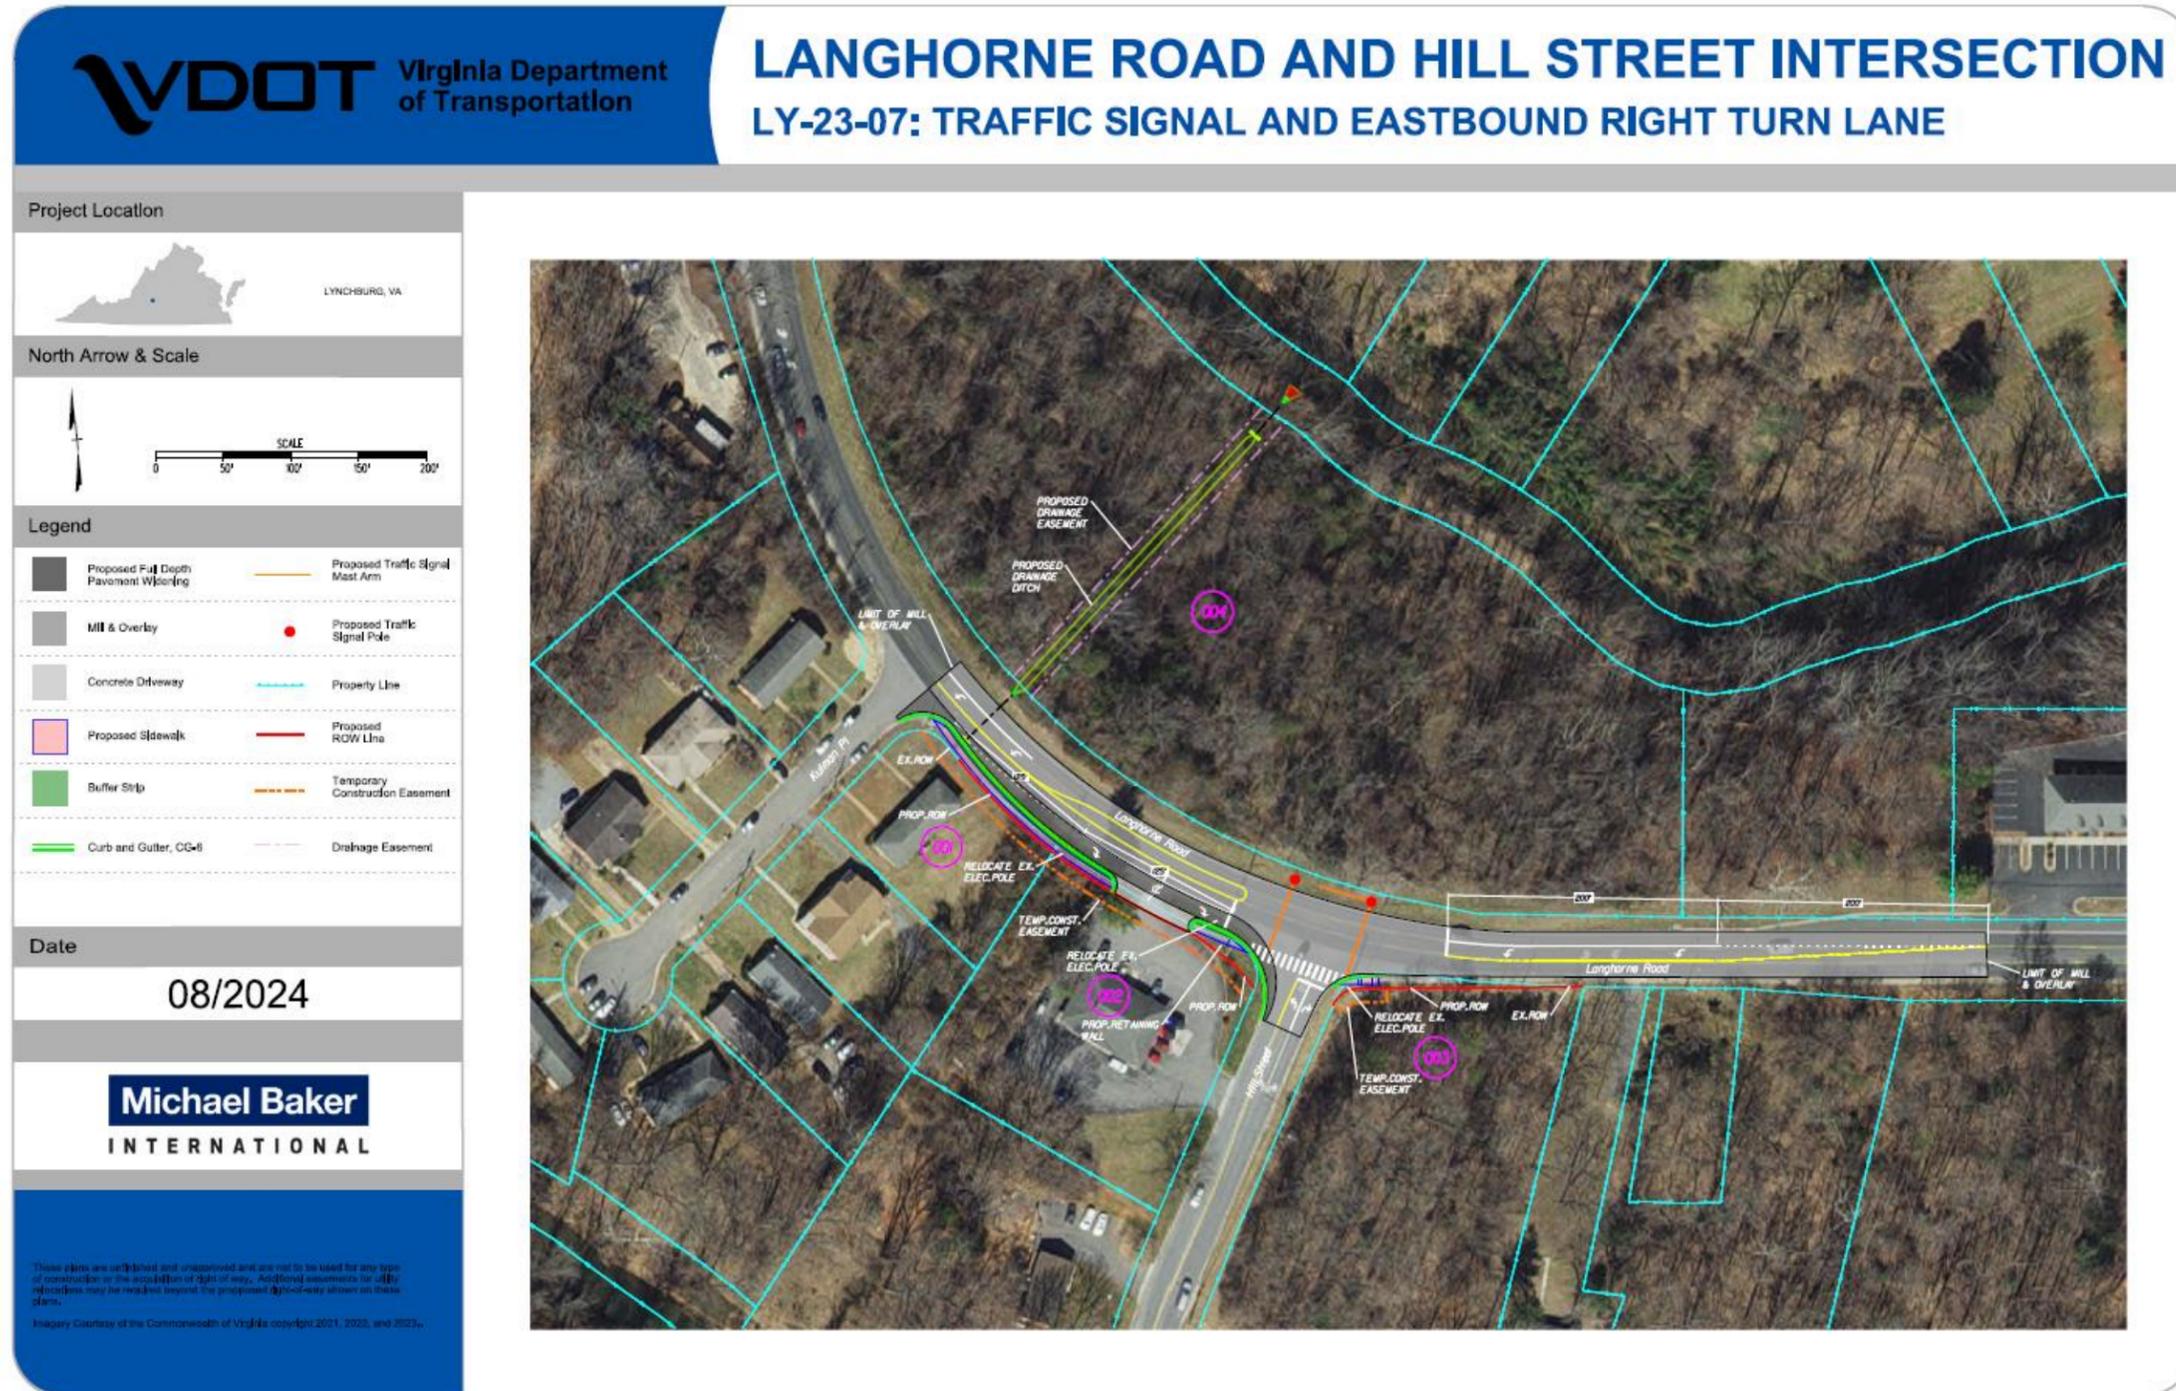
Final Design for Langhorne Road and Hill Street Intersection
